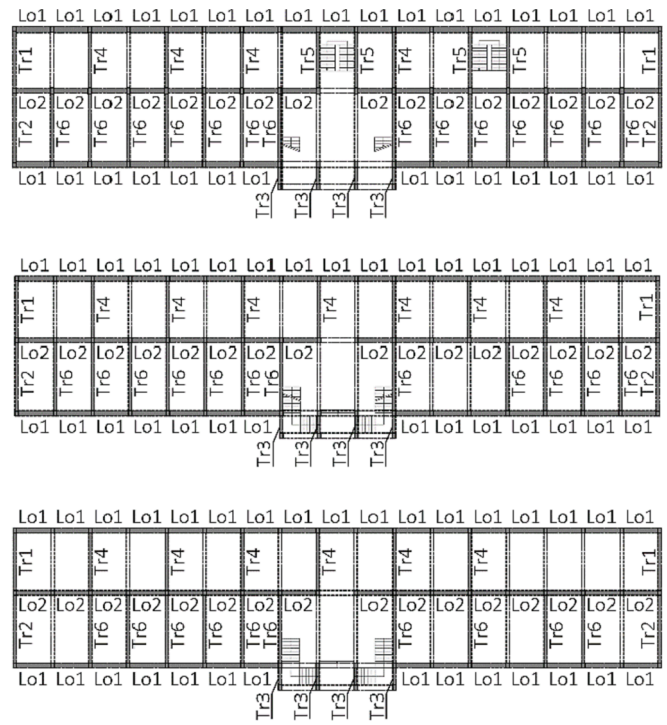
Nomenclature and locations of infills and partitions (from top to bottom plan: ground, first and second storey).
